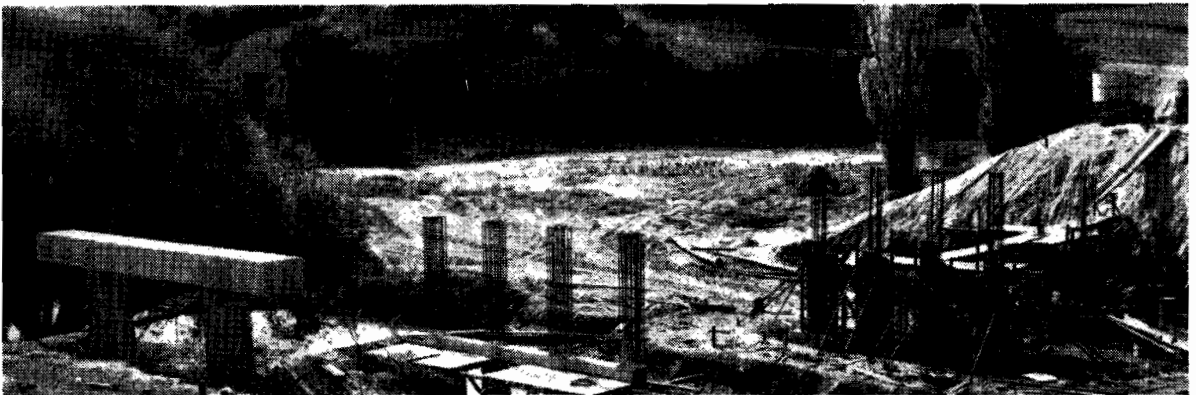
New bridge under construction over Howqua River on Mansfield-Wood's Point Road.
